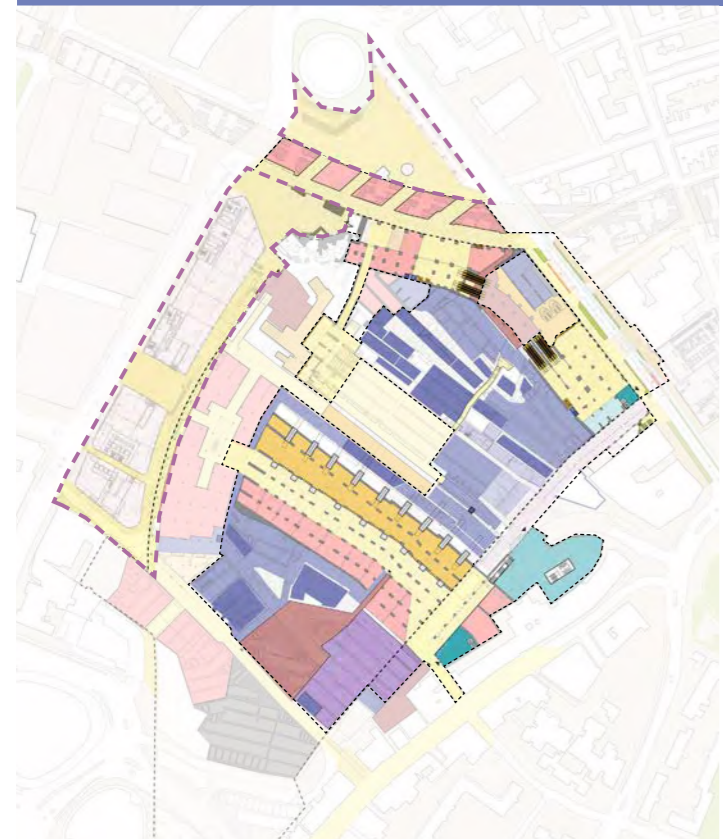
Grade / Undercrofts Level Sketch Plan
